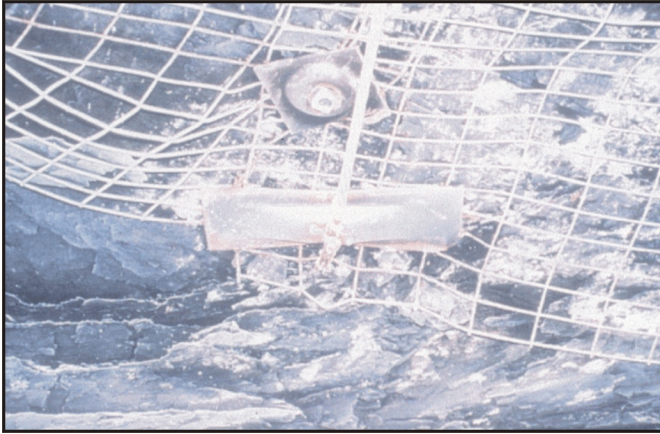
Roof damage from horizontal stress around cable truss in headgate just outby the face.
